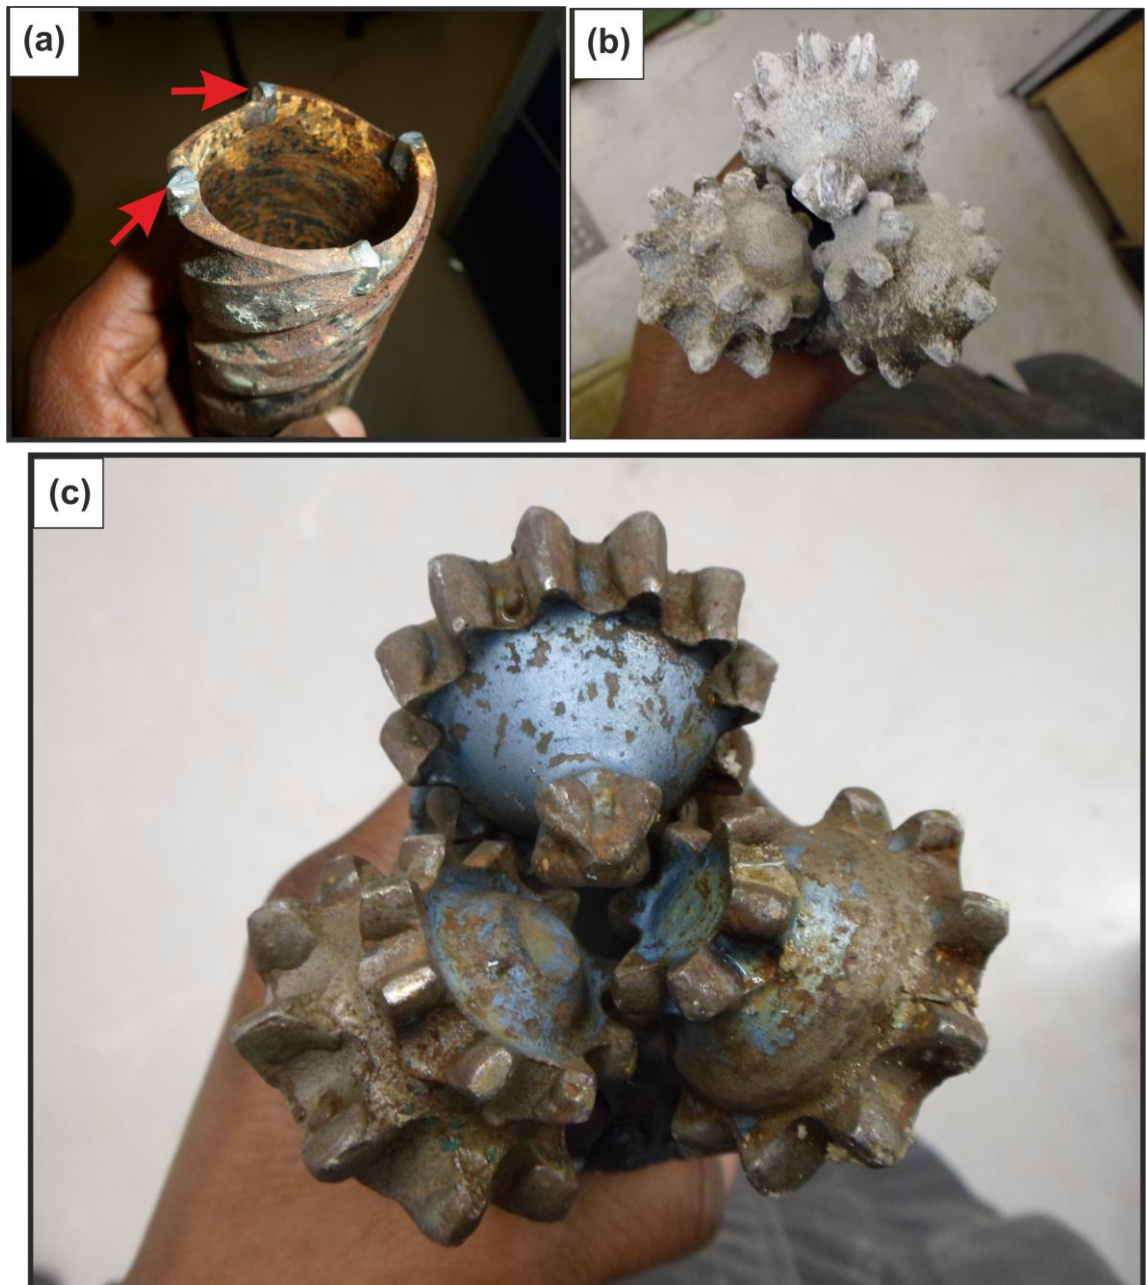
Worn drill bits after drilling through flints. (a) Damaged core bit (arrows showing broken Tungsten carbide insert). (b) Tricone bit after drilling test on flints. Note the drilling grits covering the bits. (c) Worn tricone bit after drilling dark brownish grey flints.
